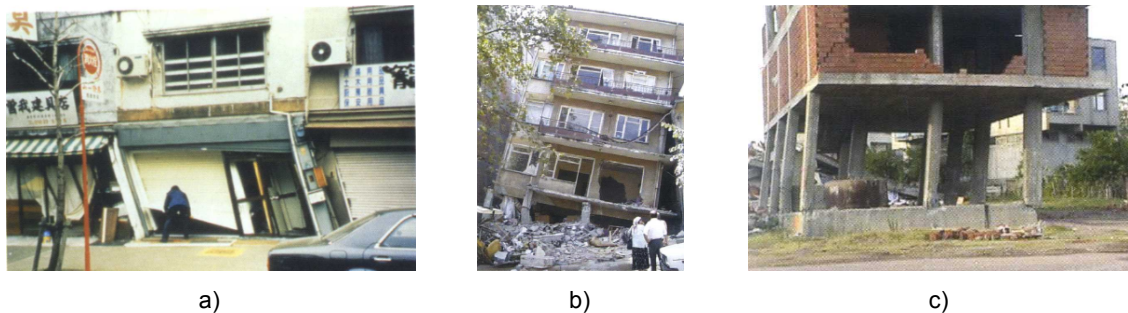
Effect of the seismic action over soft-stories on the ground floor (Lopes *et al.*, 2008): a) Timber building damaged after the 1989 Earthquake in Kobe, Japan; b) Reinforced concrete building damaged after an earthquake; c) Reinforced concrete building damaged during the construction process.
